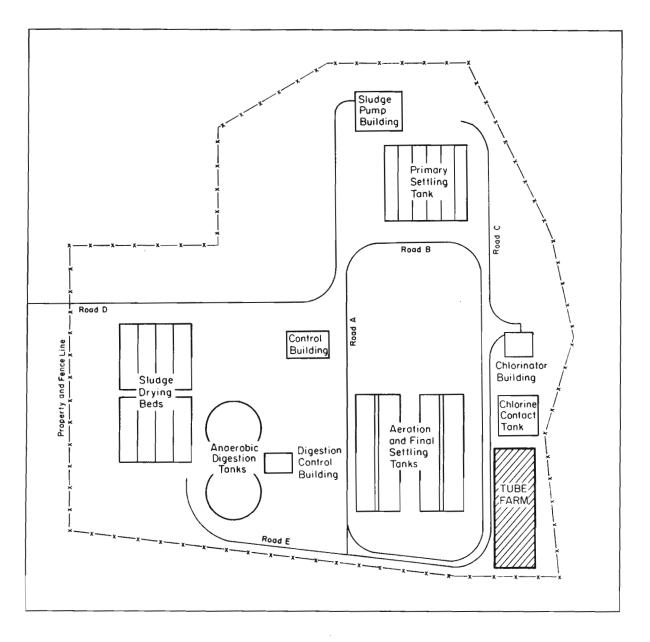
SIMPLIFIED PLAN OF MILILANI SEWAGE TREATMENT PLANT SHOWING LOCATION OF TUBE FARM
